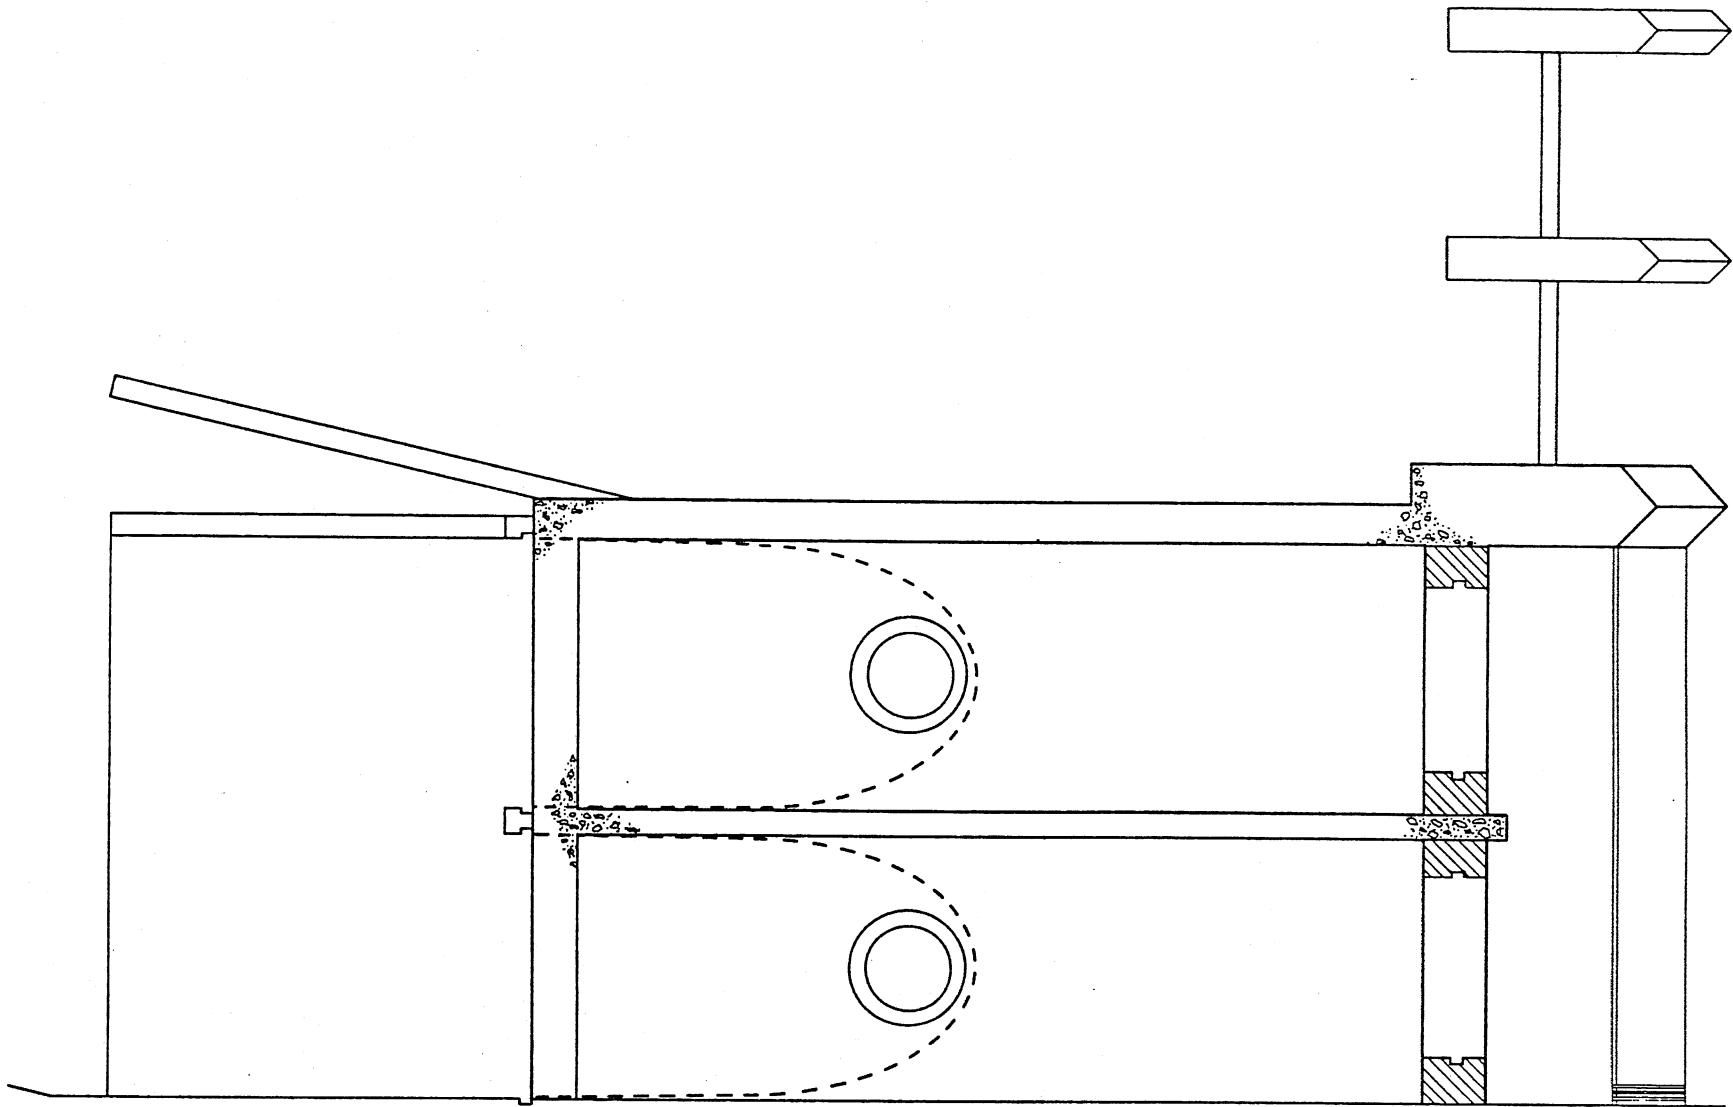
Plan View of Alternative B: Replacement With Two 1650 mm Vertical Units.
